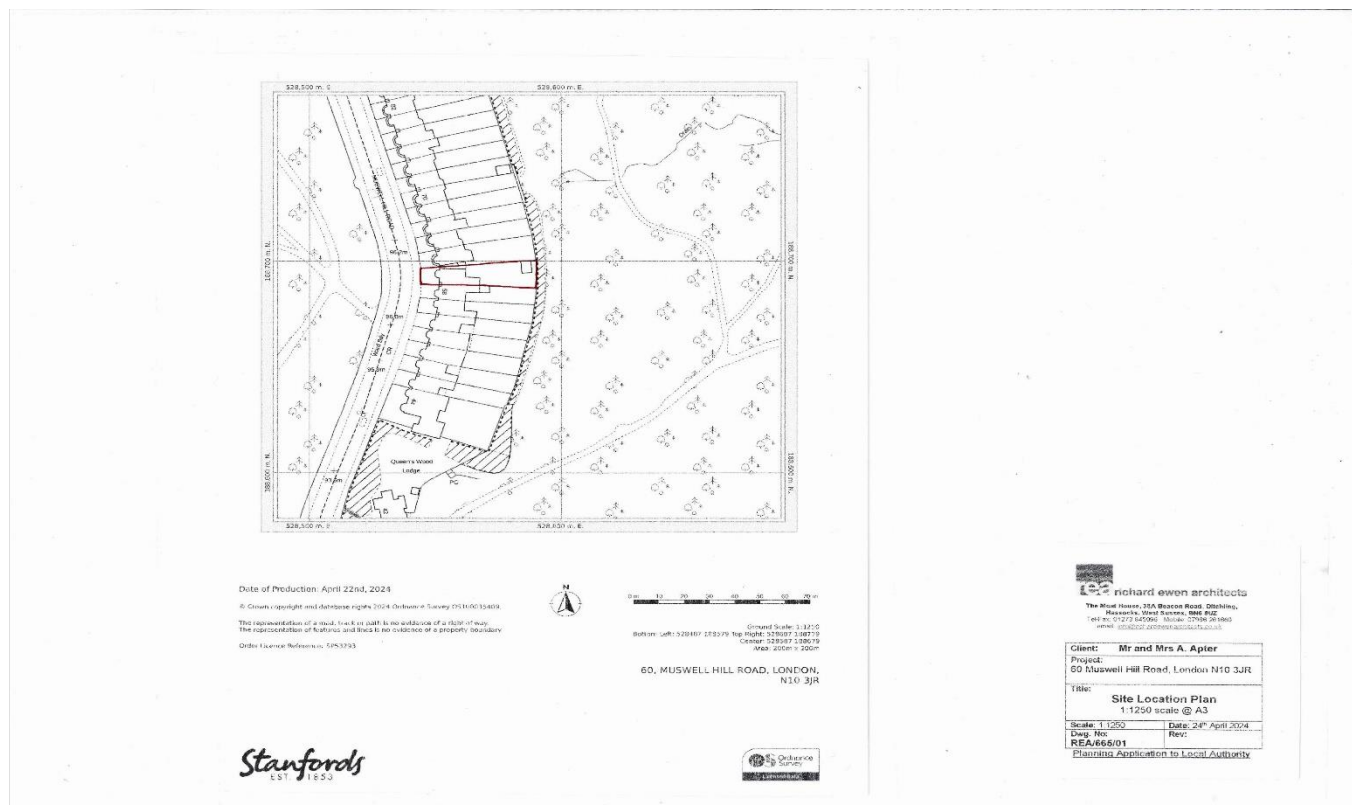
60 Muswell Hill Road – Proposed Site Location Plan.
